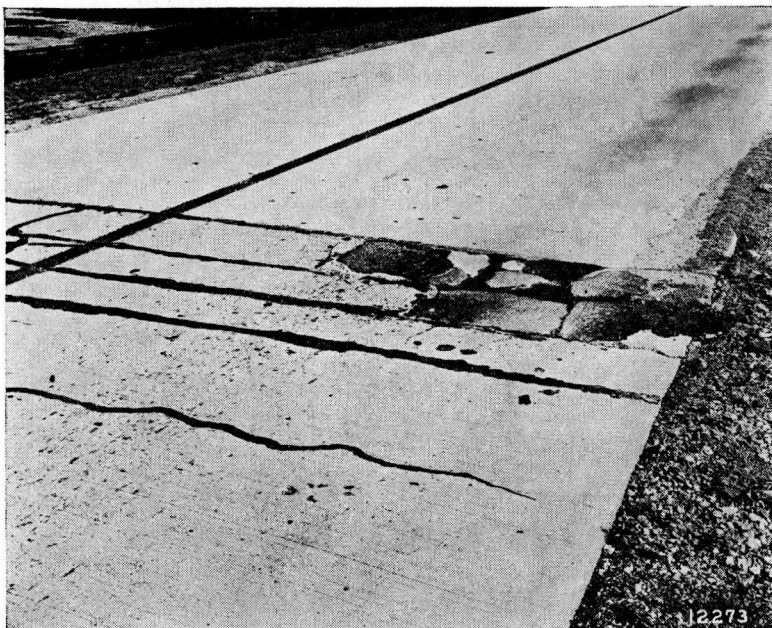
View Looking East from Sta. 292 + 75 Showing Excellent Pavement Beyond Localized Failure.
